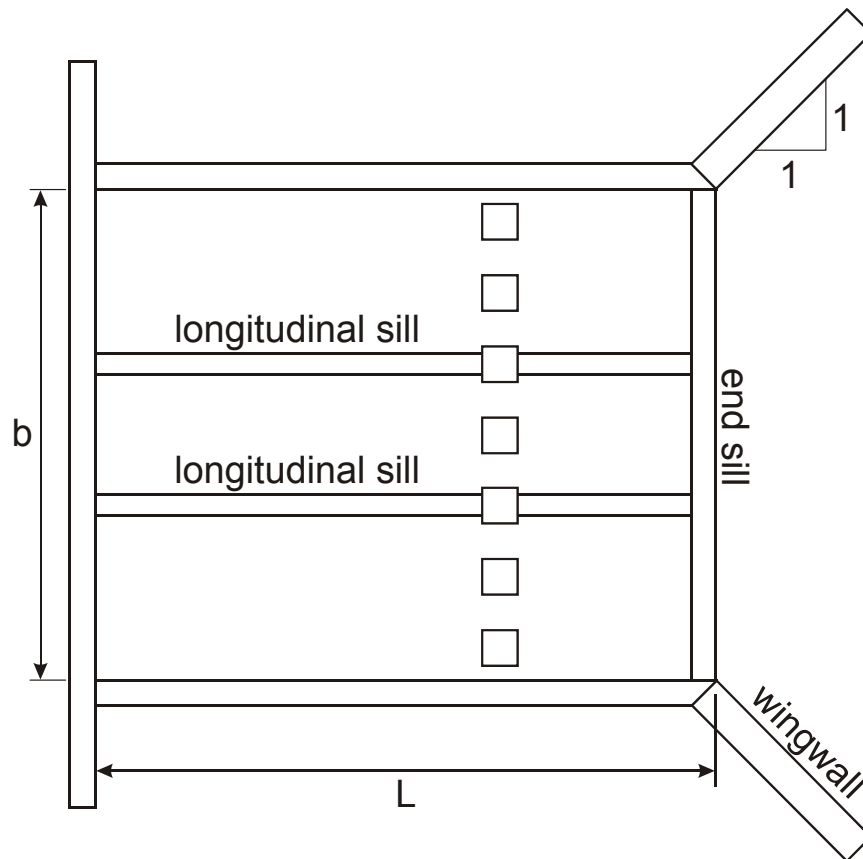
Plan view of a drop spillway showing longitudinal sills and square floor blocks (flow is from left to right)
